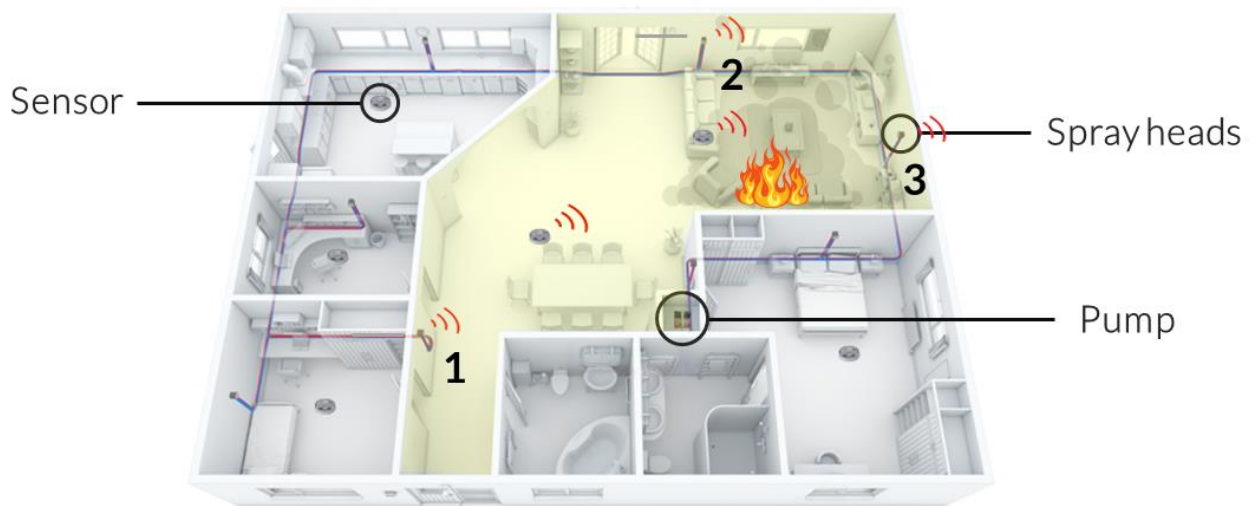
Yellow zone (above) contains 3 wall mounted spray heads and 2 ceiling mounted smoke sensors
